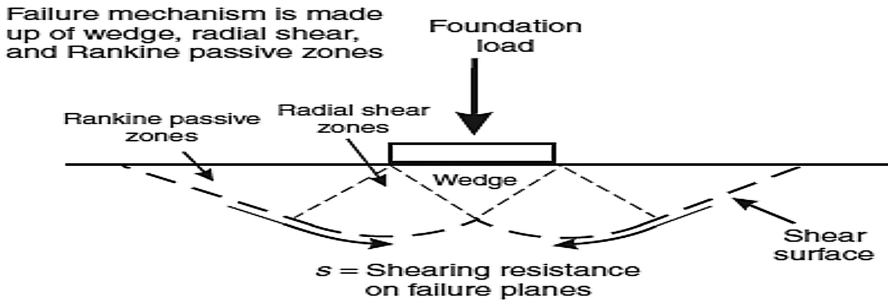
Failure mechanism for bearing capacity [11].
